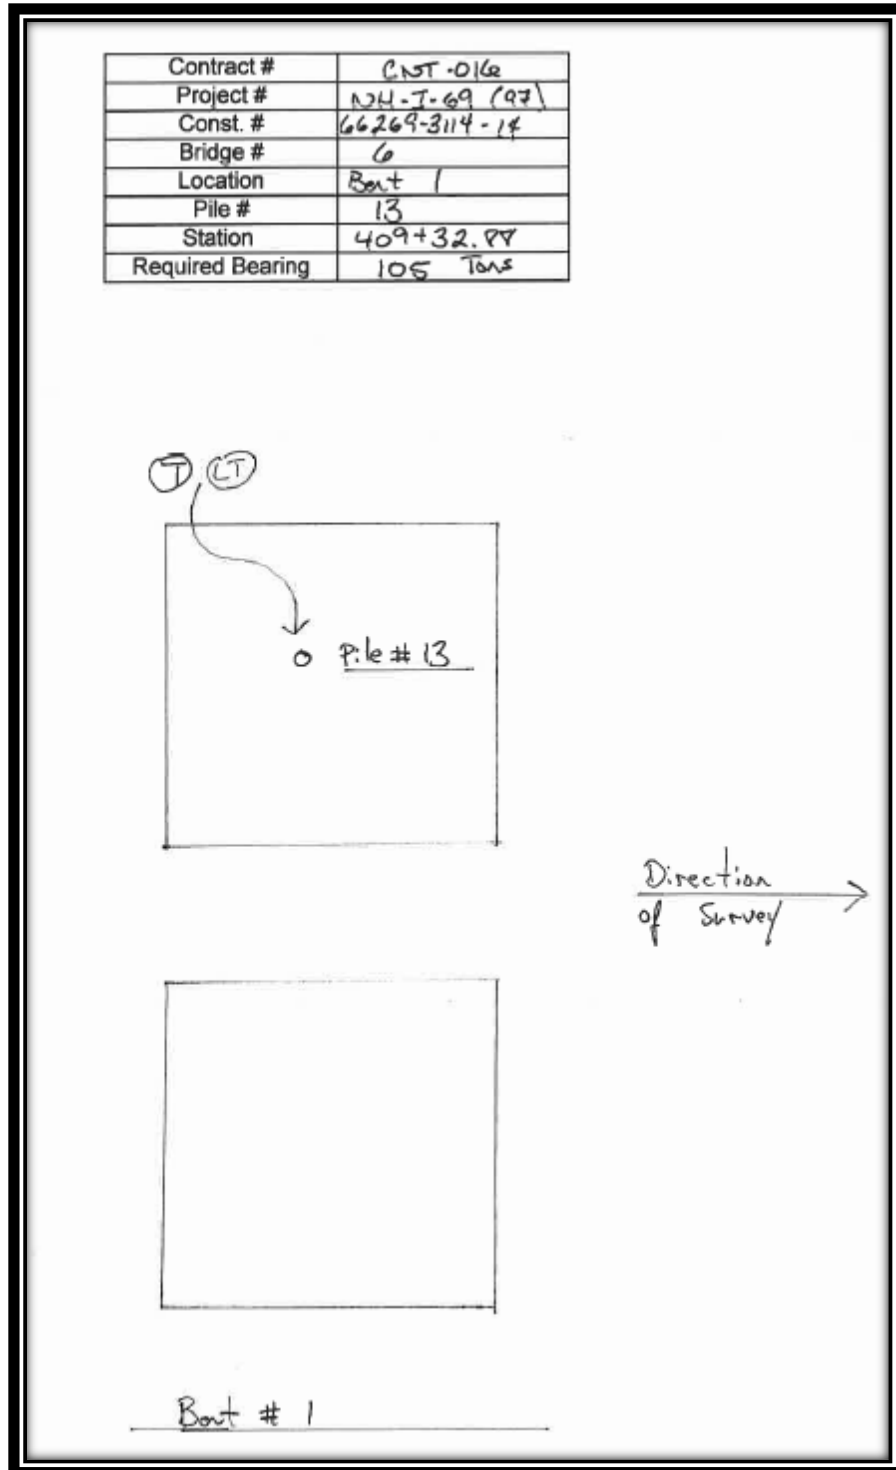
Example Sketch Showing Location of Test Pile to Be Load Tested
